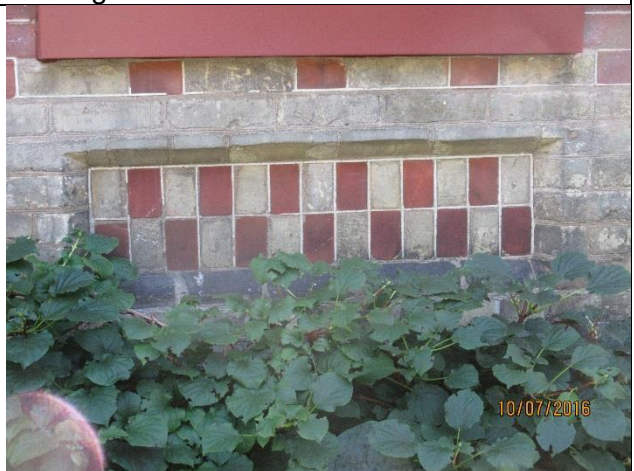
Detail of checkerboard dichromatic brickwork detail in recessed panel.
